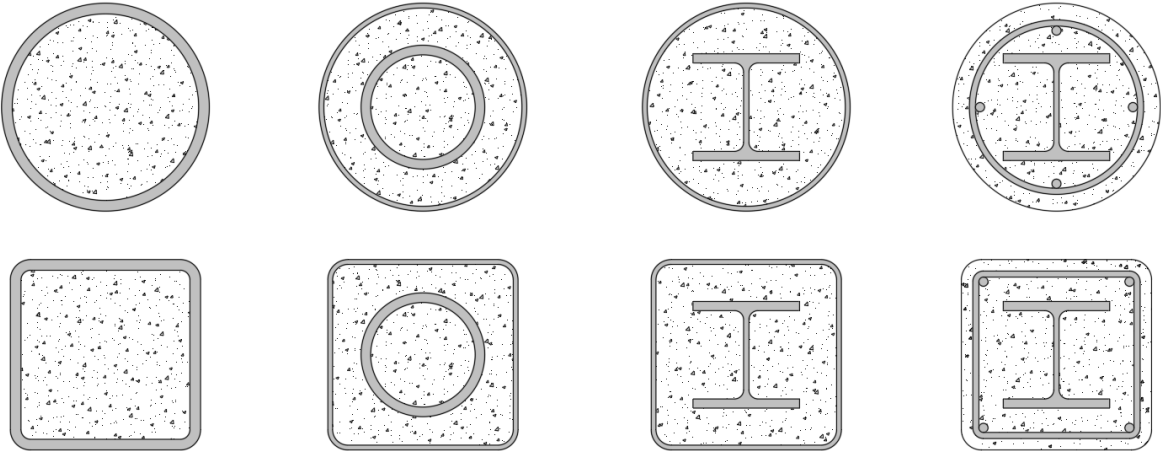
Typical cross-sections of steel-concrete composite columns.
